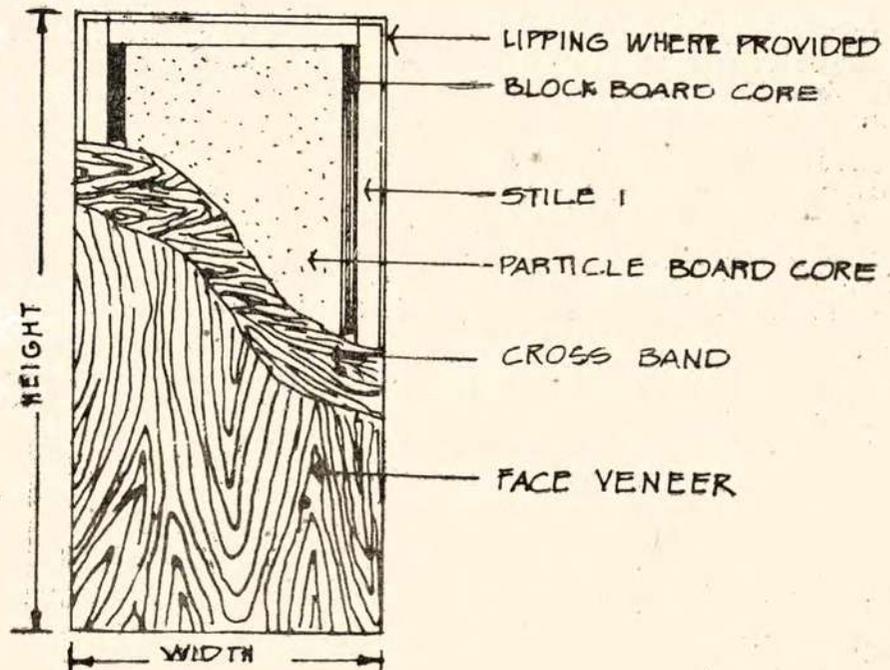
TYPICAL PARTICLE BOARD AND BLOCK BOARD CORE FLUSH DOOR SHUTTER
